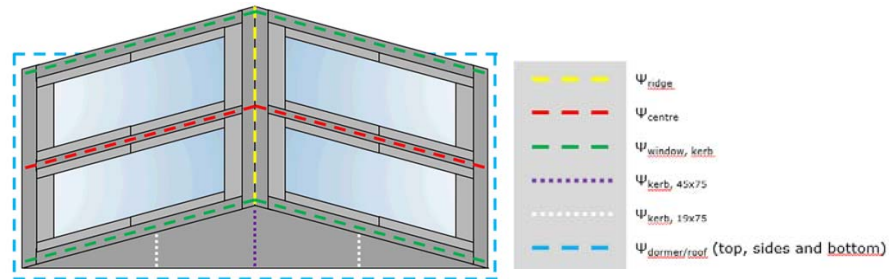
Overview of linear heat loss in the Dormer construction and between the VELUX Dormer and the roof construction.
